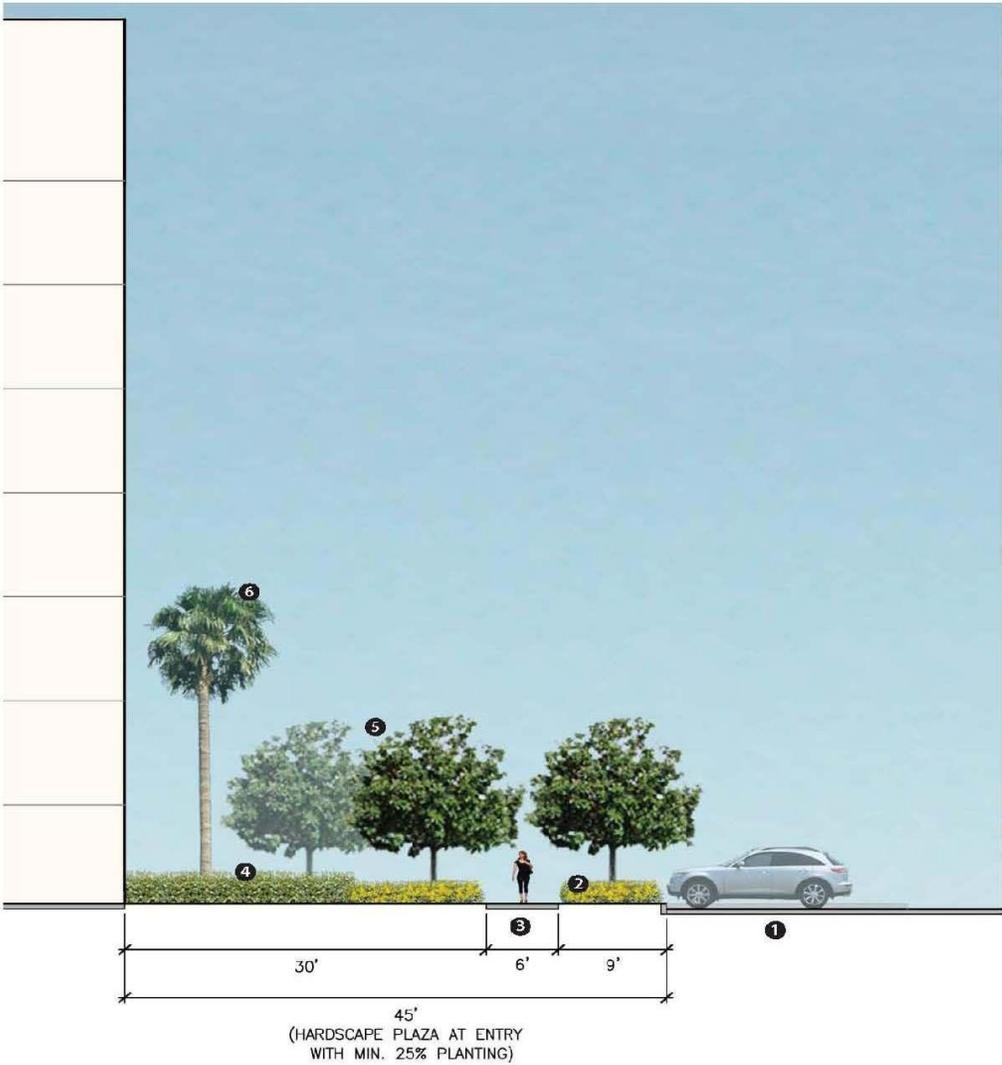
3-4 Story Office Building Front Facade
